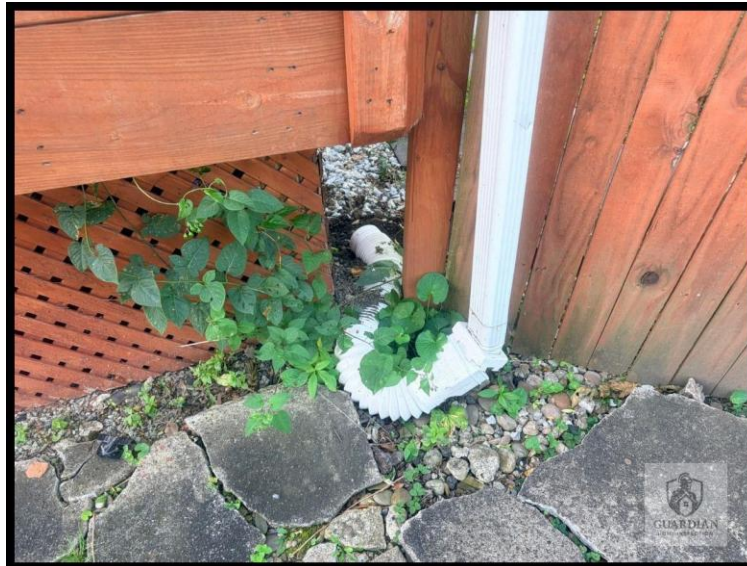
A downspout extension was observed to be disconnected/loose and discharging roof runoff at the foundation, with vegetation overgrowth around the discharge area.
